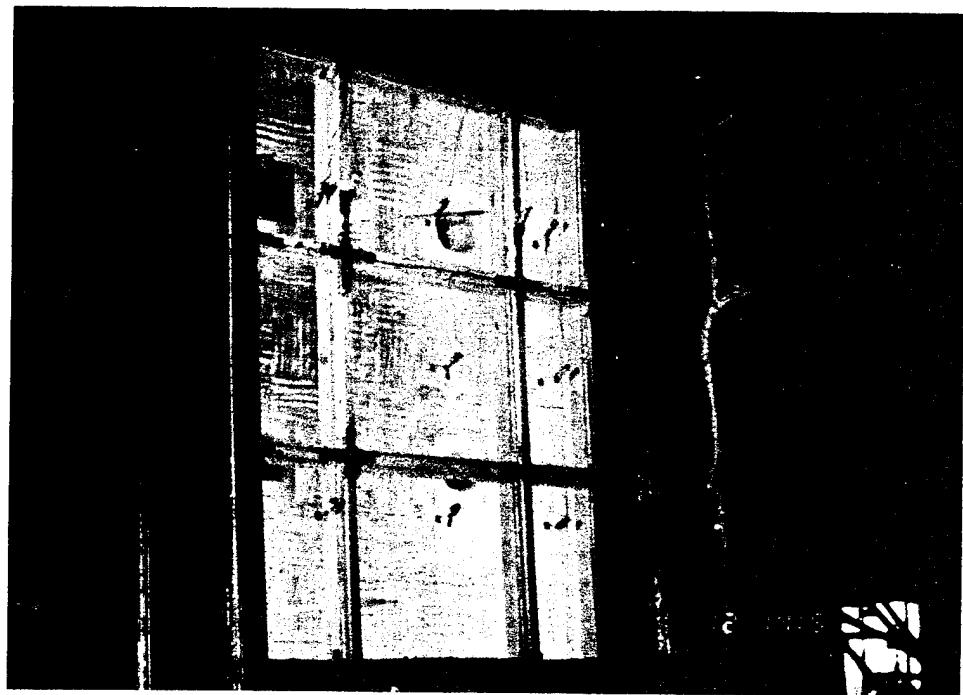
View of Unexposed Face of First Assembly Near End of 60-Minute Exposure
